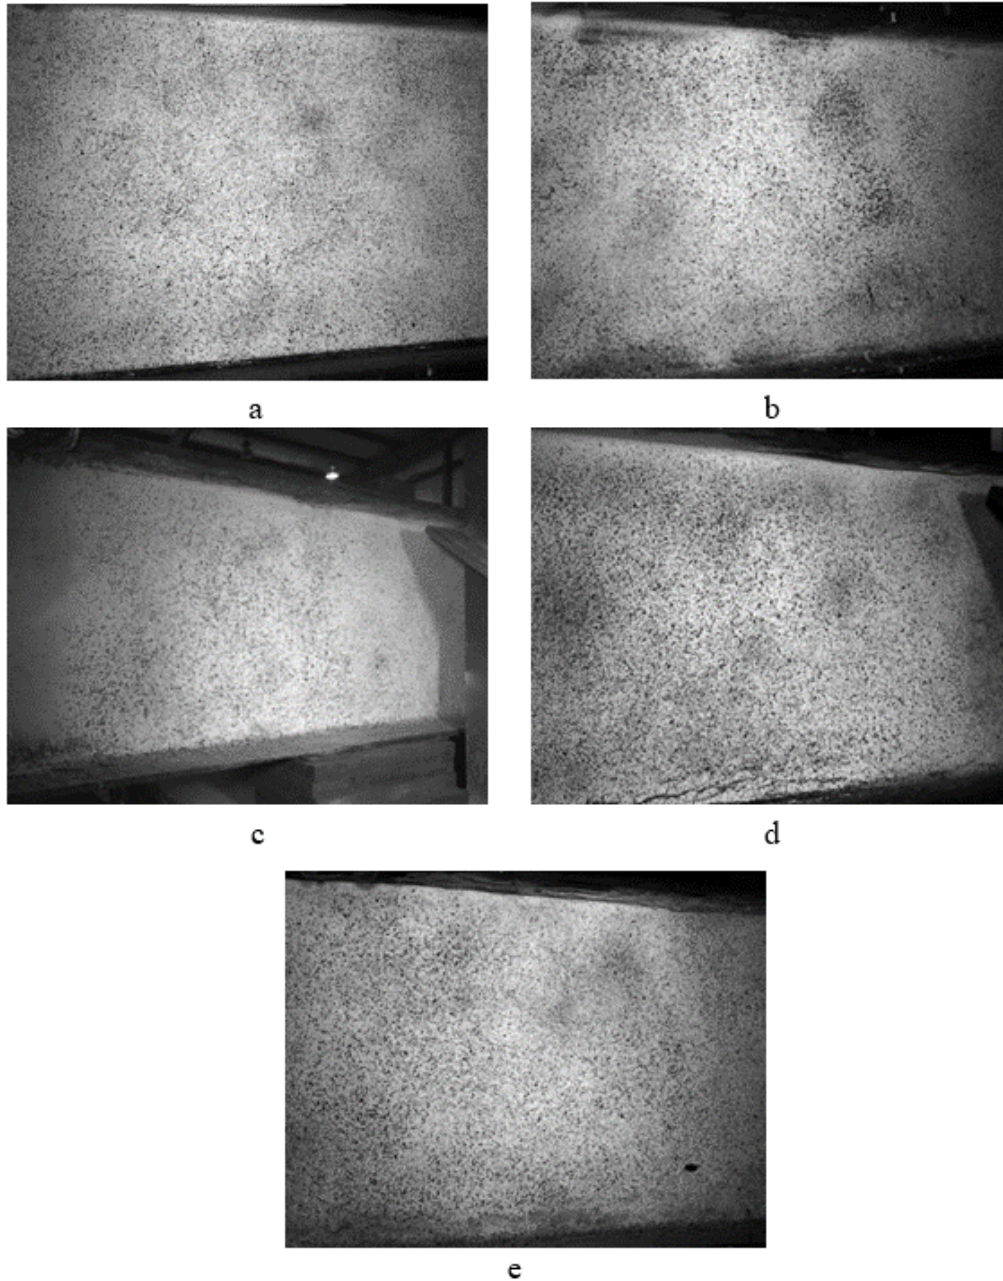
Photographs of W10x26 Beam End Specimens With Stochastic Patterns Showing Corrosion Damage: (a) 5-W10-L; (b) 6-W10-ML; (c) 7-W10-MH; (d) 8-W10-H.
